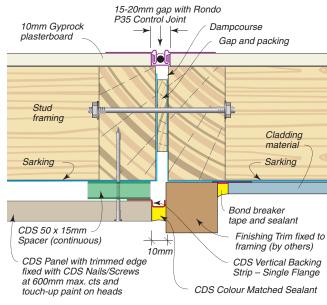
Typical Detail Junction with Fibre Cement Cladding System – Plan View
